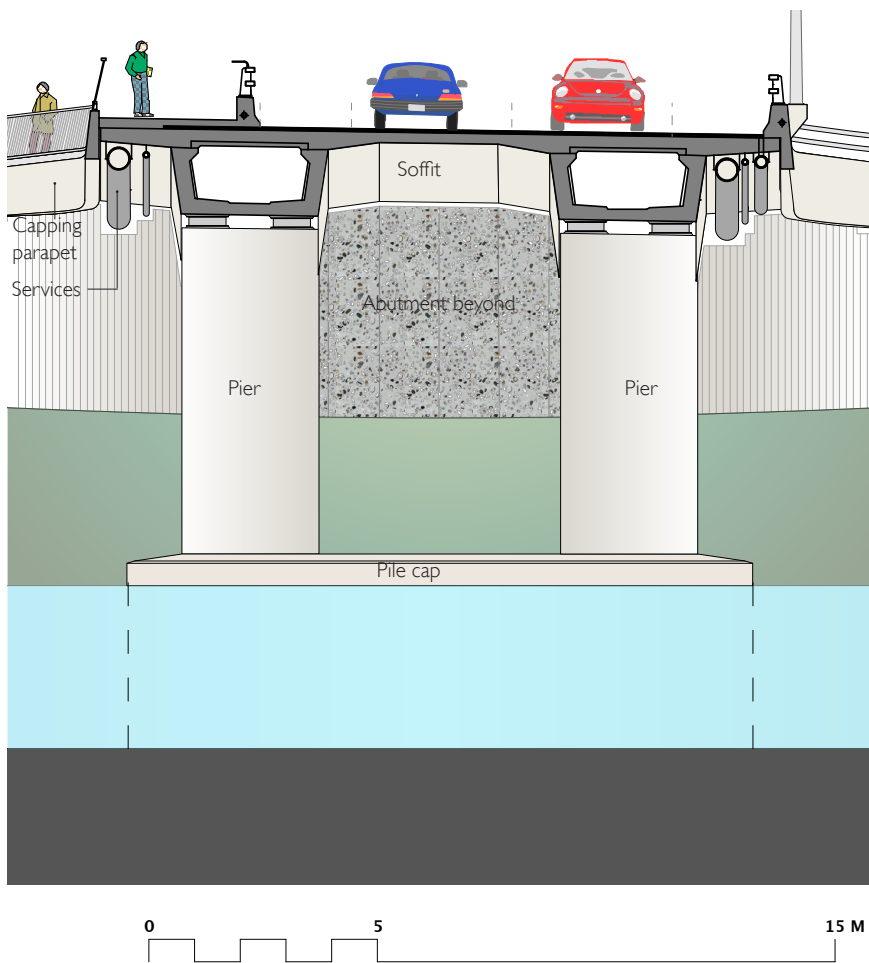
Detail of paired piers in cross section as viewed towards the northern abutment. Note that bridge elevation shows curved profile to the north.
